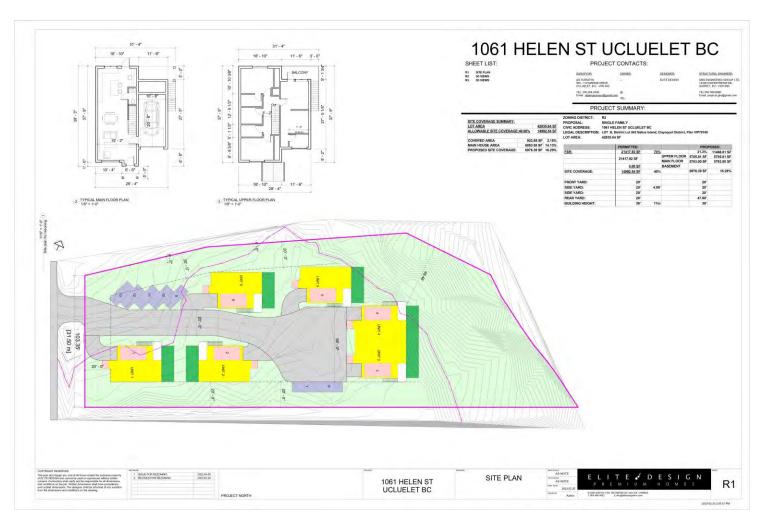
Revised site plan (Jan. 2024) for the proposed construction at 1061 Helen Road. The pink dashed line approximates top-of-bank.
